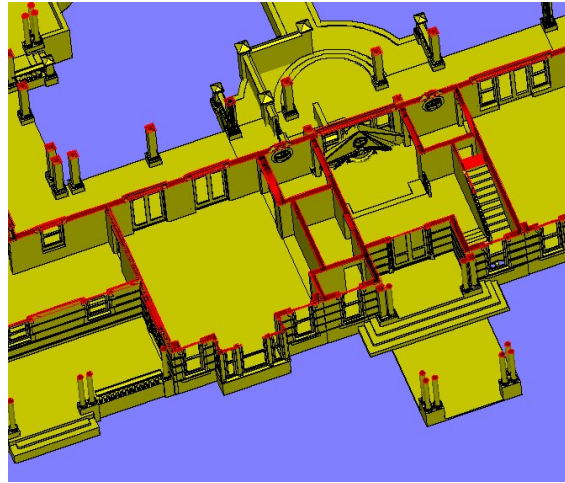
Close-up of Internal Detail like stairs, steps, etc.
